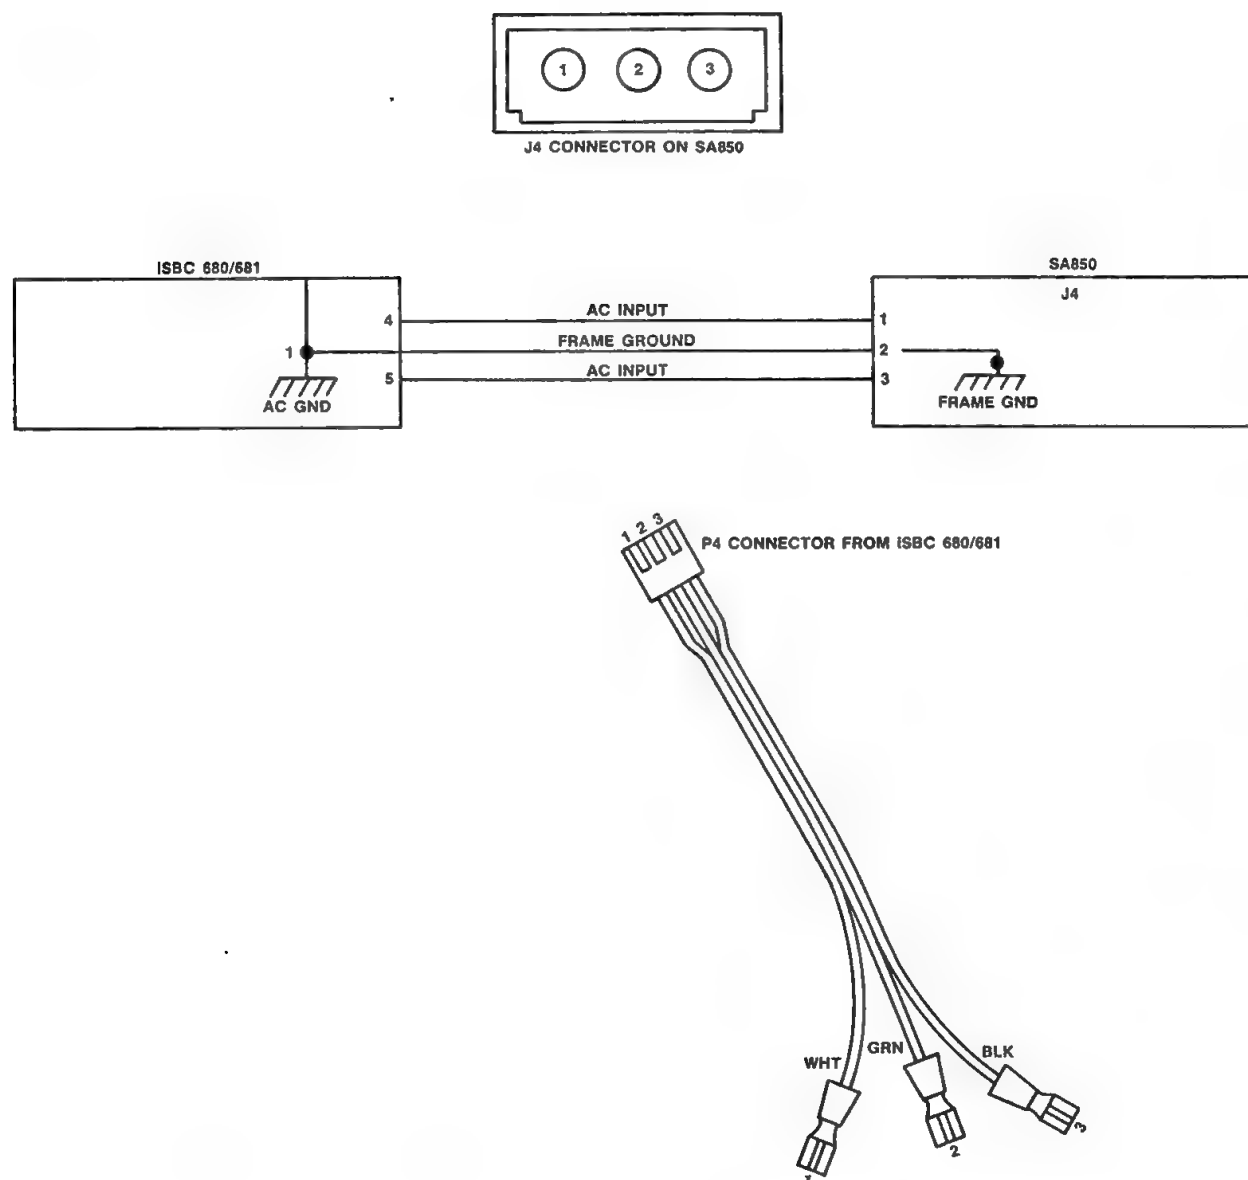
AC Wiring for Shugart SA850 Diskette Drive Interface
